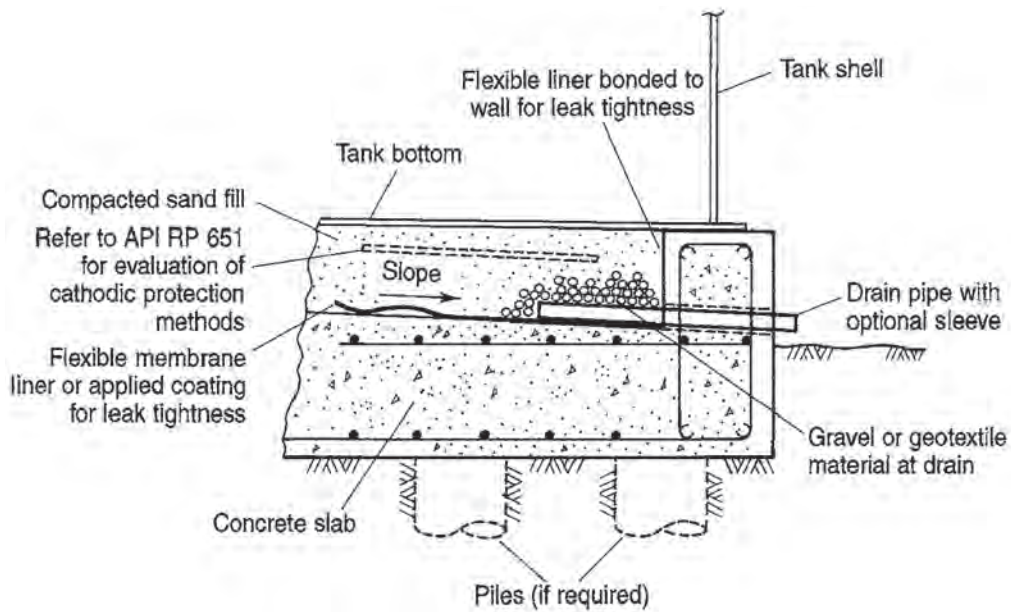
Reinforced concrete slab with undertank leak detection at the perimeter (from API, 2005)
